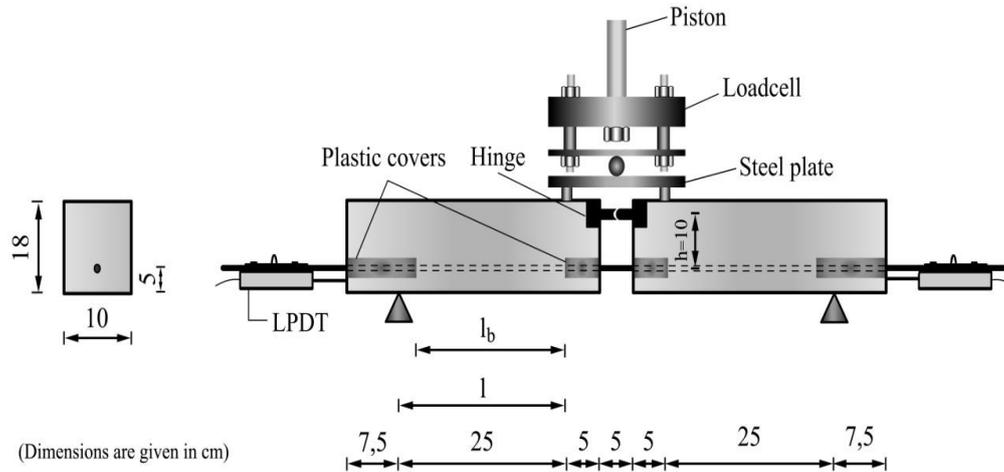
Test set-up of standard Belgium hinged beam test and dimensions of specimens
